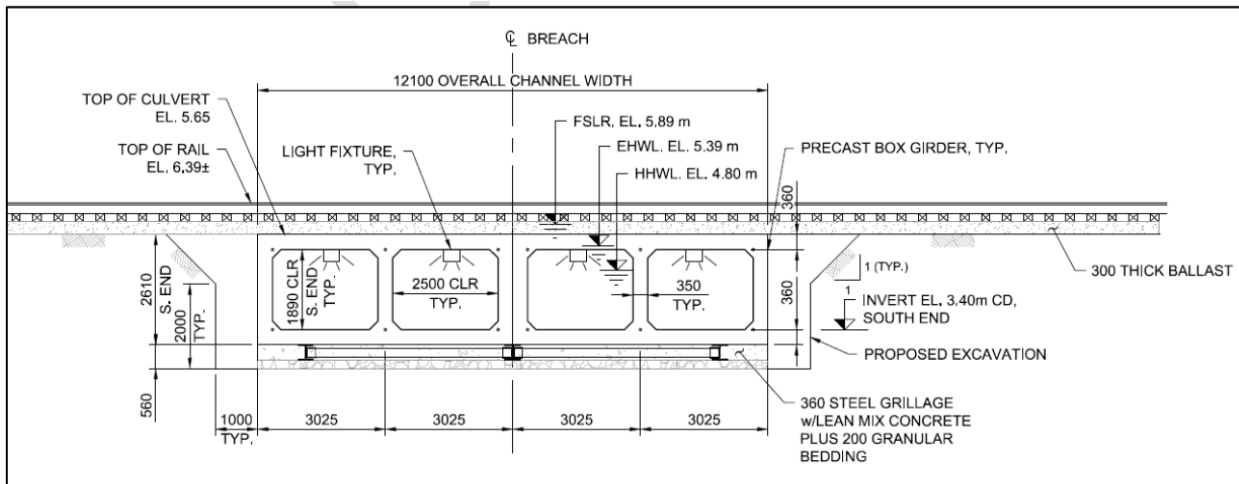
Conceptual concrete box culvert geometry under existing causeway tracks at causeway breach location 1 (from Appendix IR2020-2.2-B). Note that elevations are preliminary.
